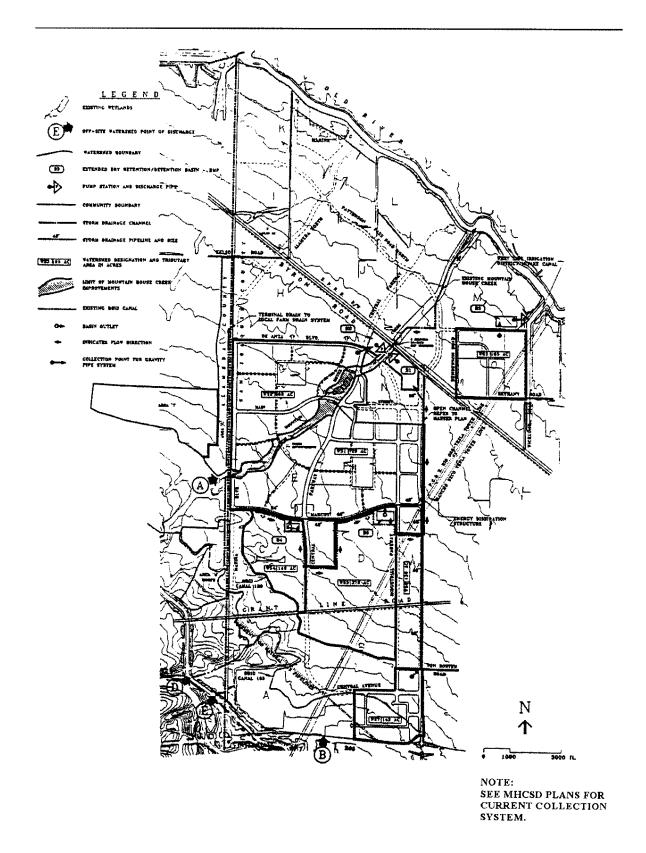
STORM DRAINAGE COLLECTION SYSTEM
